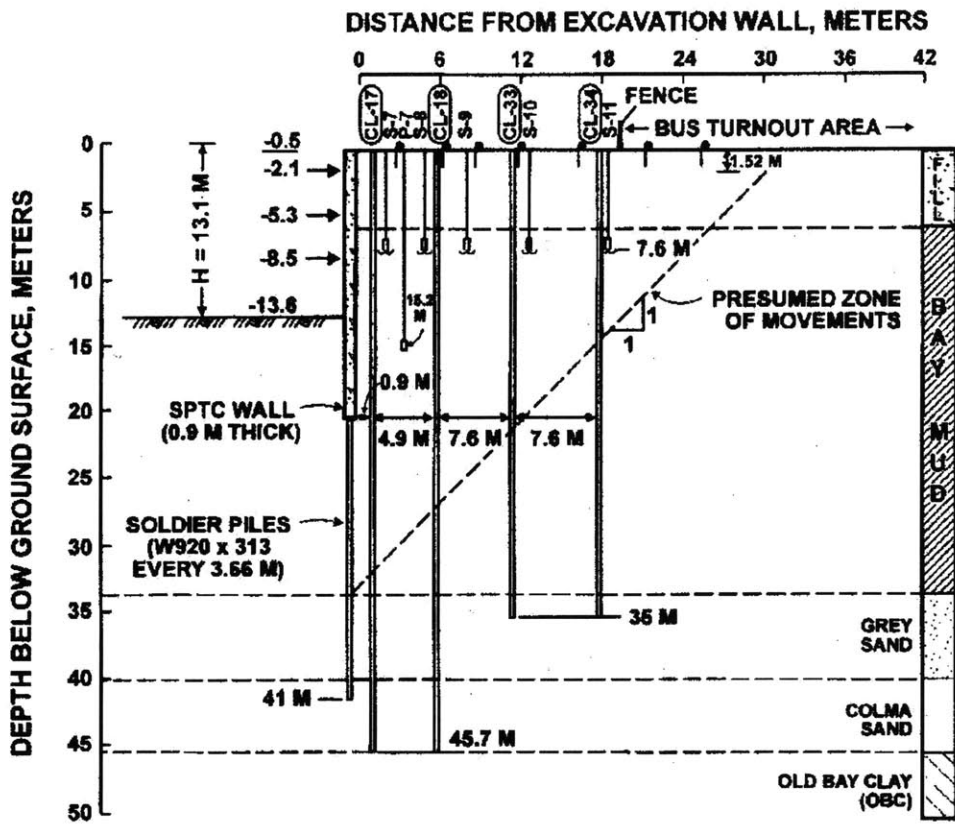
Excavation Section and Strut Locations (Koutsoftas et al., 2000)
